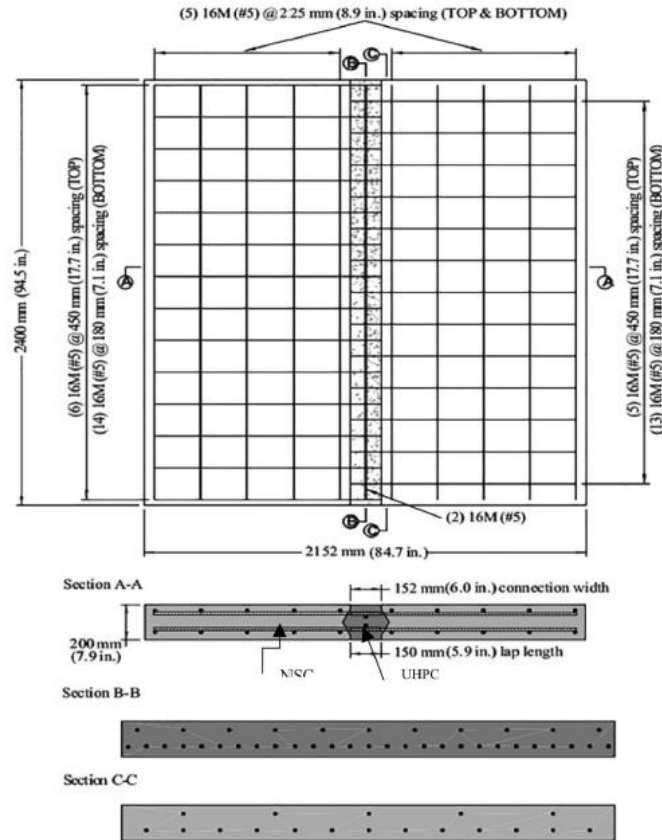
Reinforcement details for panel 8G (Graybeal 2010)
